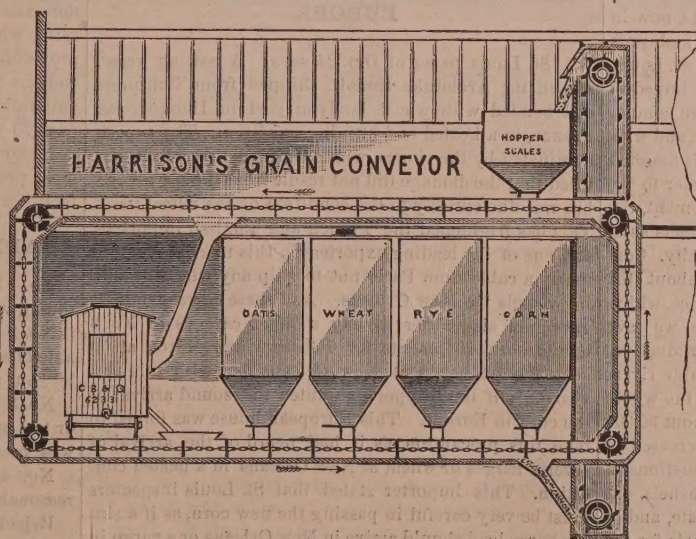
SHOWING ARRANGEMENT OF CONVEYOR.
